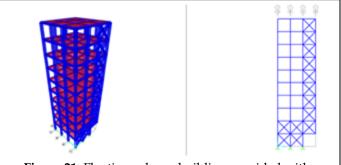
Floating column building provided with bracings at the corner on all storeys and the base
